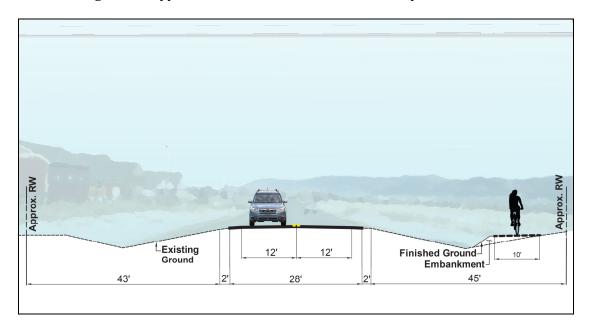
South 19th Street corridor looking north (typical section S1-a)
